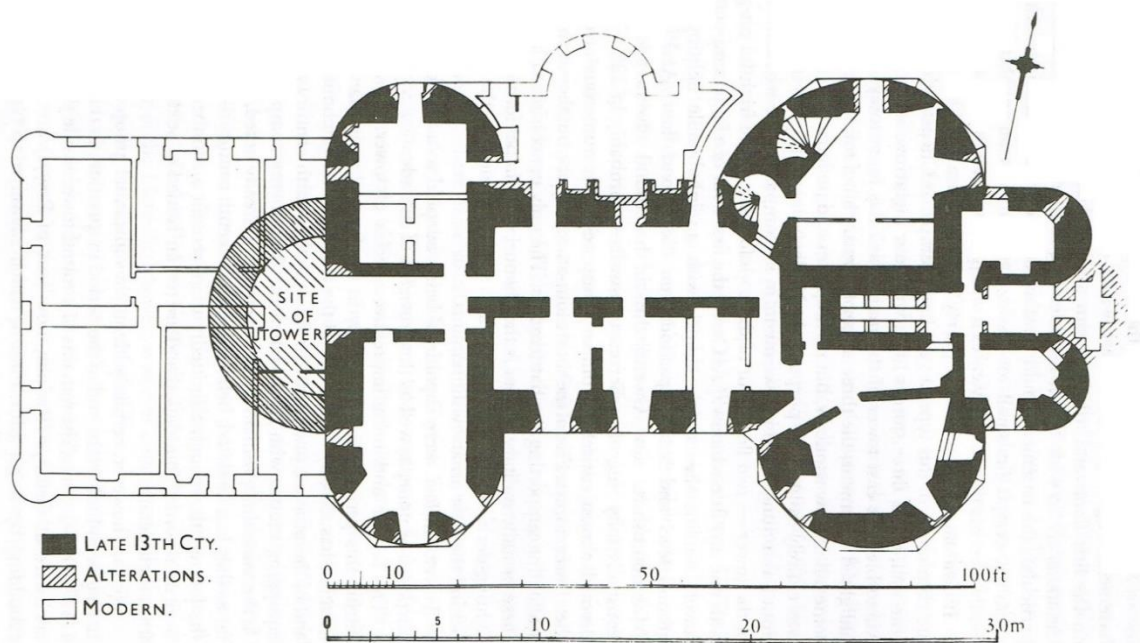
Ground-floor plan of Picton Castle, by D. J. C. King (from King 1988, 123; adapted from Girouard 1960, 20 Fig. 6)
